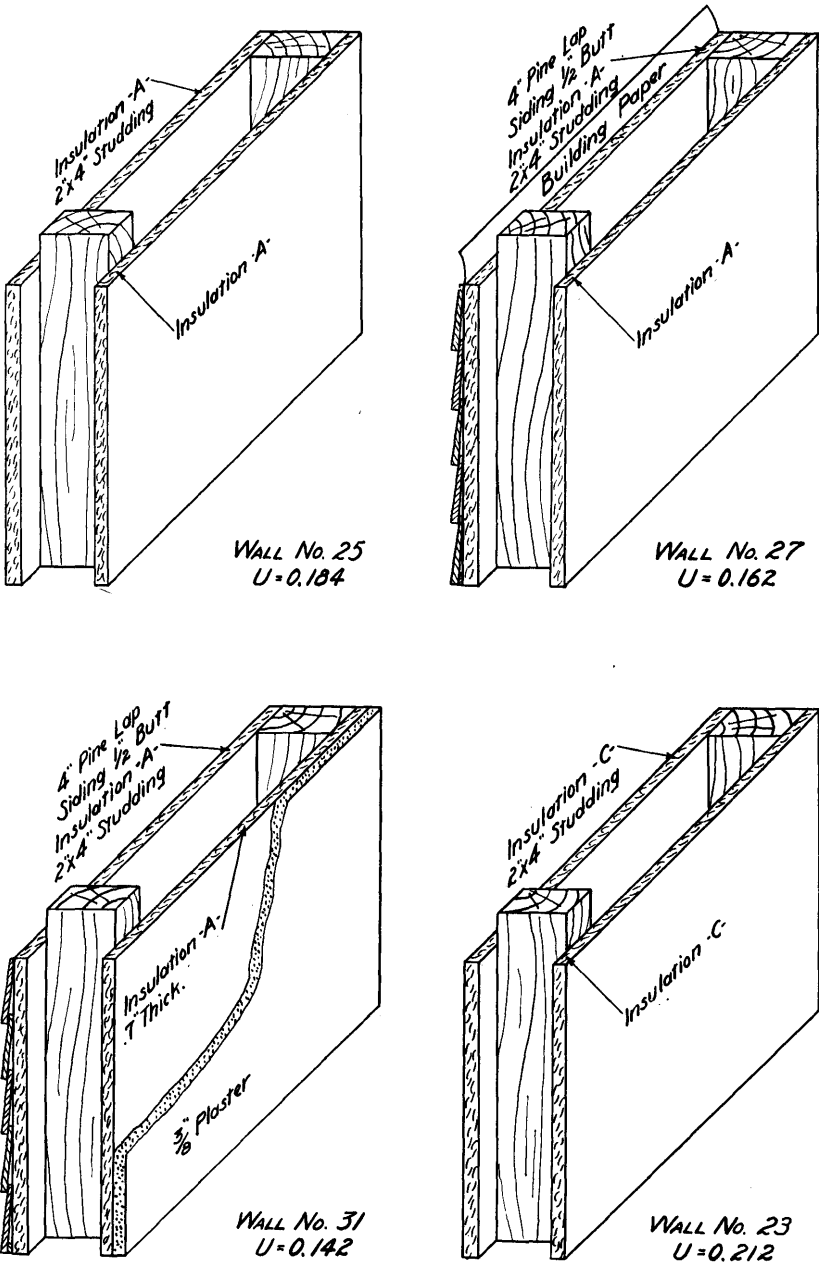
SECTIONAL VIEWS OF TEST WALLS
